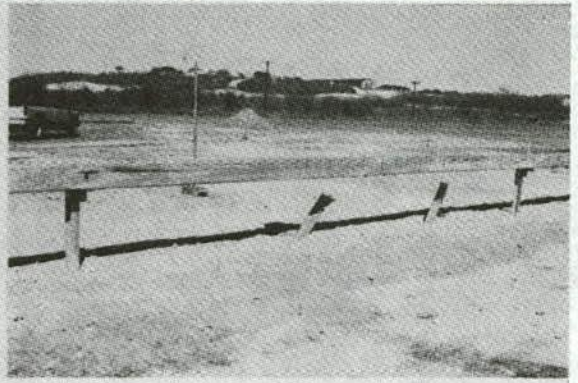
Barrier and vehicle damage after guardrail tests.
